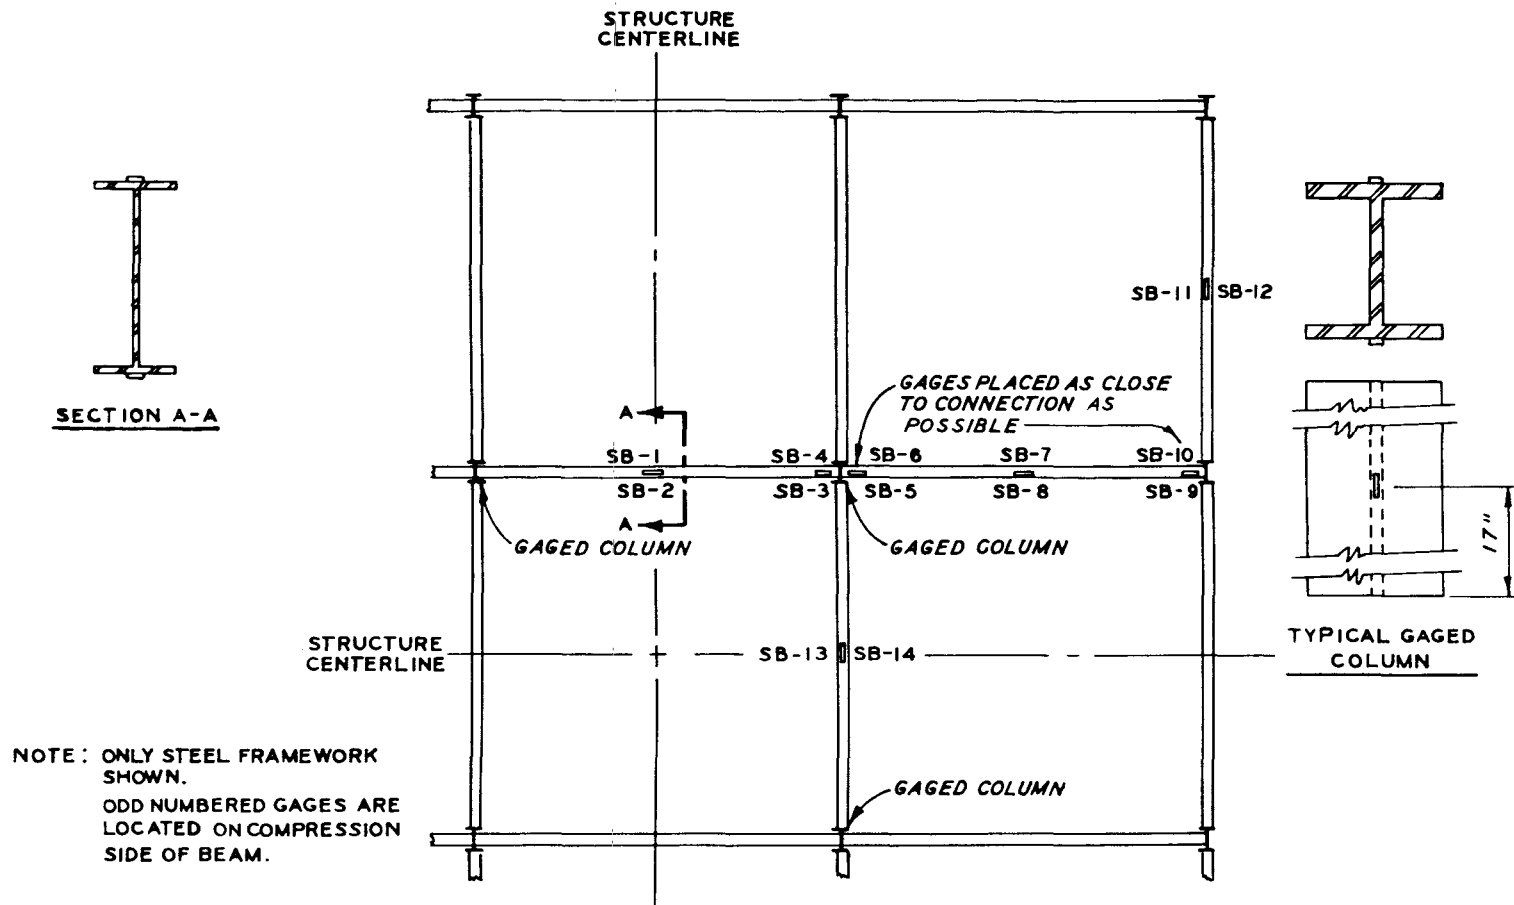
Strain gage locations on structural steel frame, static and dynamic models.
